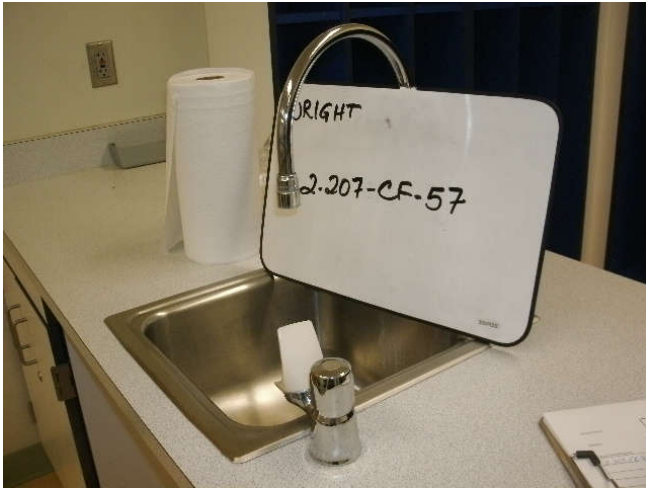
Classroom faucet w/bubbler, located on the 2nd floor, in room 207.
